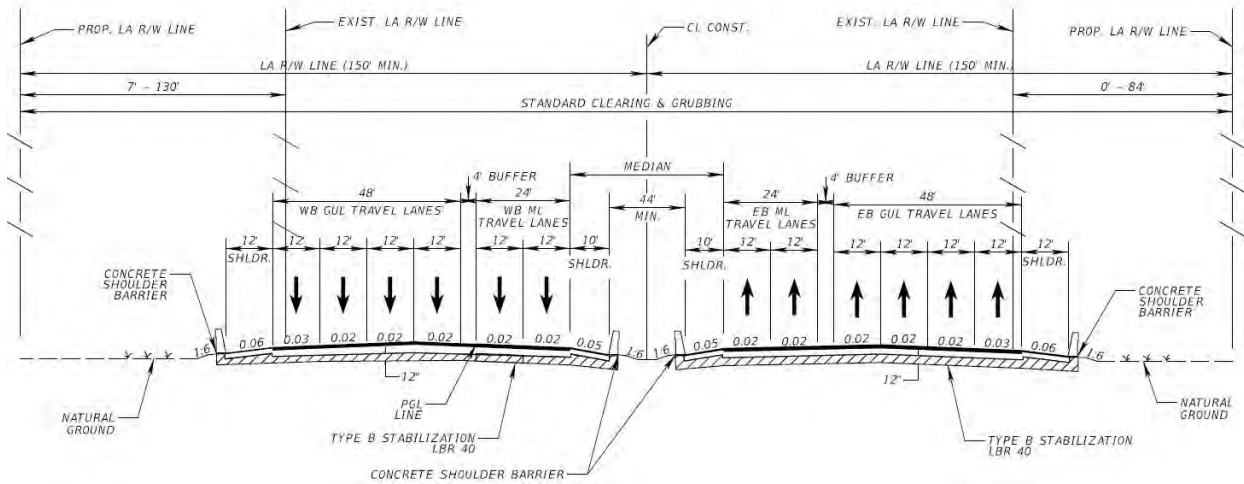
Poinciana Parkway (SR 538) Six-Lane Typical Section
